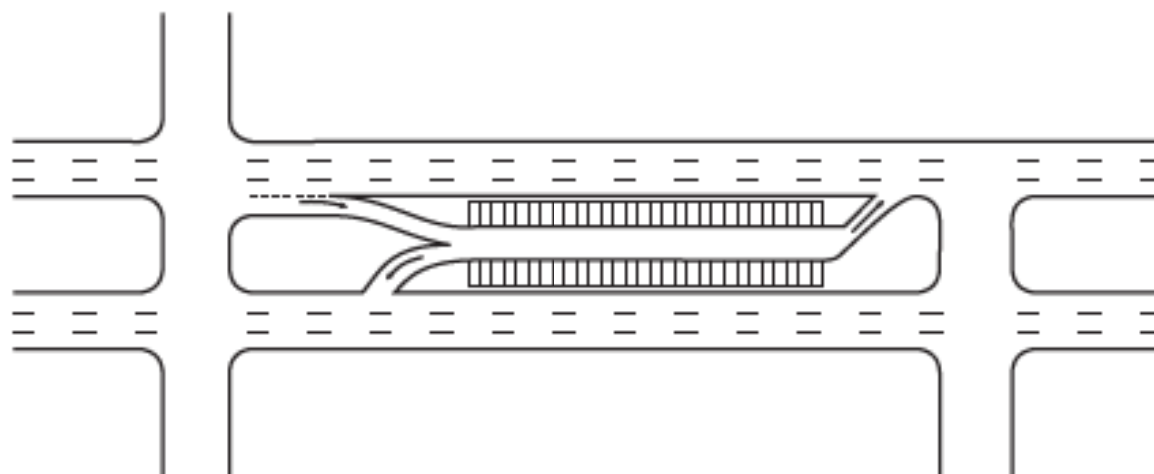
ALTERNATIVE LAYOUT FOR CENTRE-OF-ROAD PARKING
